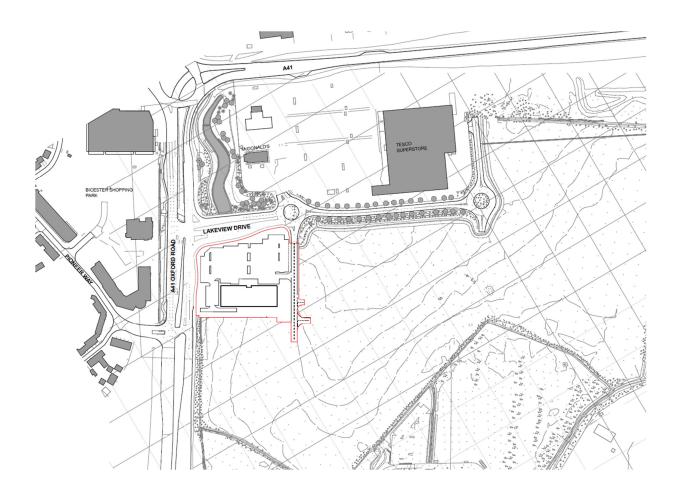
Plan showing the proposed development site in relation to the surrounding area.
